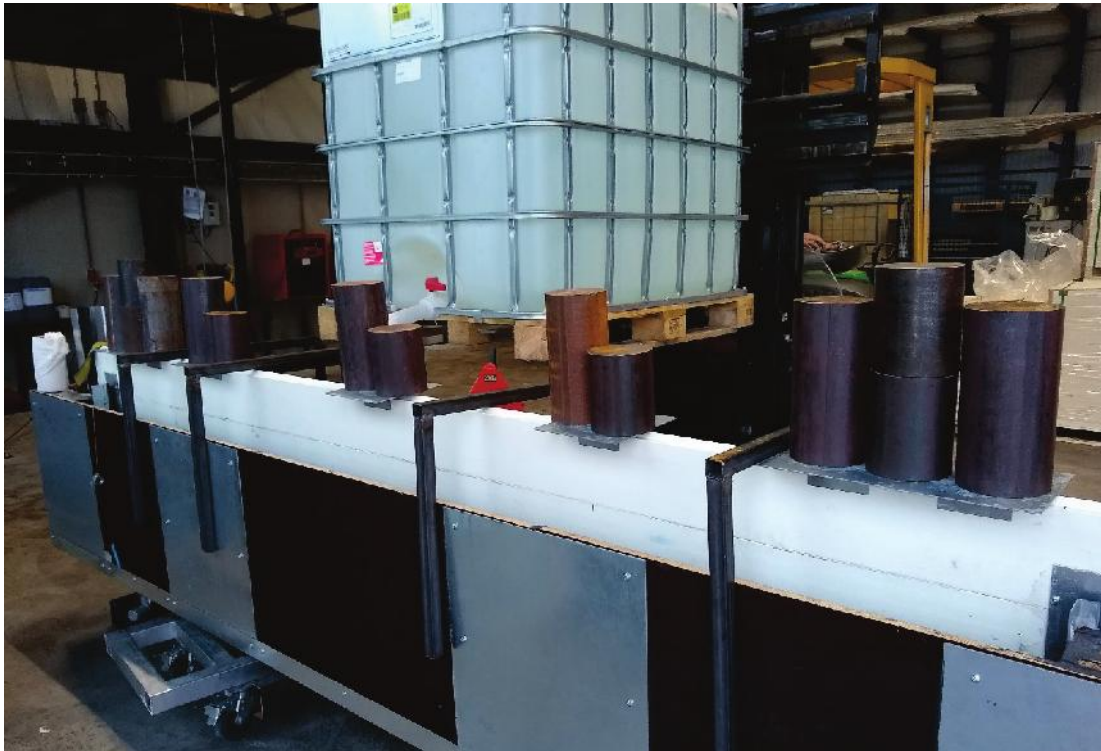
View of OHD-C with load, 500 mm test 2, water at the outside
